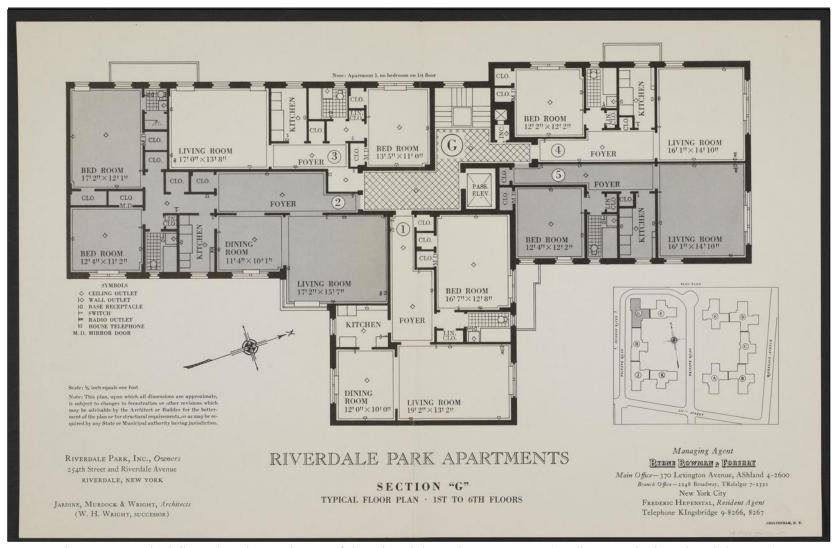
Typical floorplans in Section G of the Riverdale Park Apartments (Jardine Murdock and Wright 1939).
